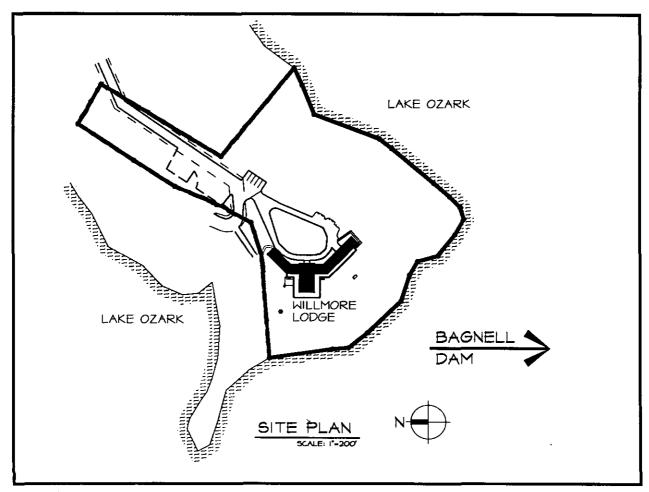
Current site plan for Willmore Lodge at 1"=200'.
